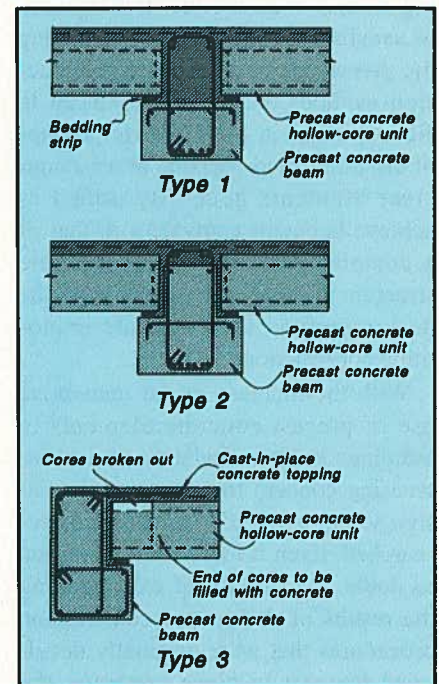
Types of support using precast concrete beams for hollow-core floor units (Ref. 3).
